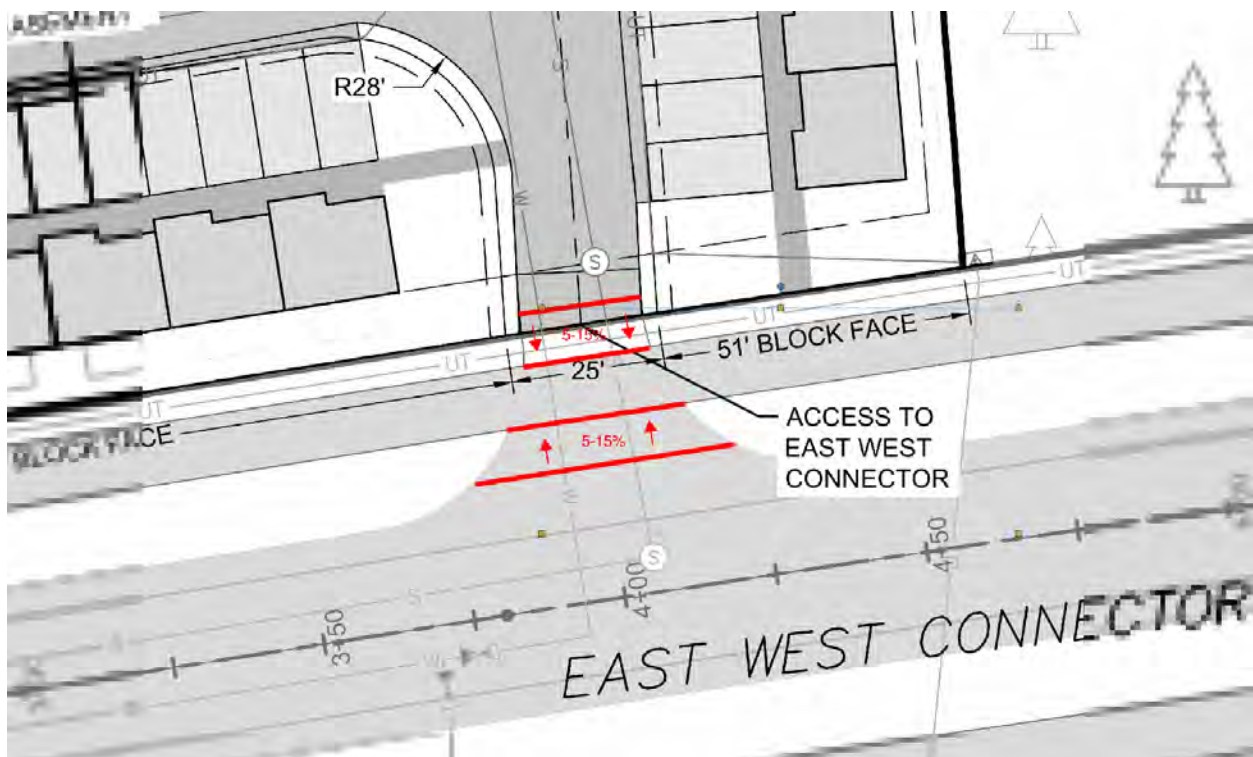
Raised Pathway Crossing. Typical for all pathway/sidewalk crossings at "Alleys" and "Roads"
